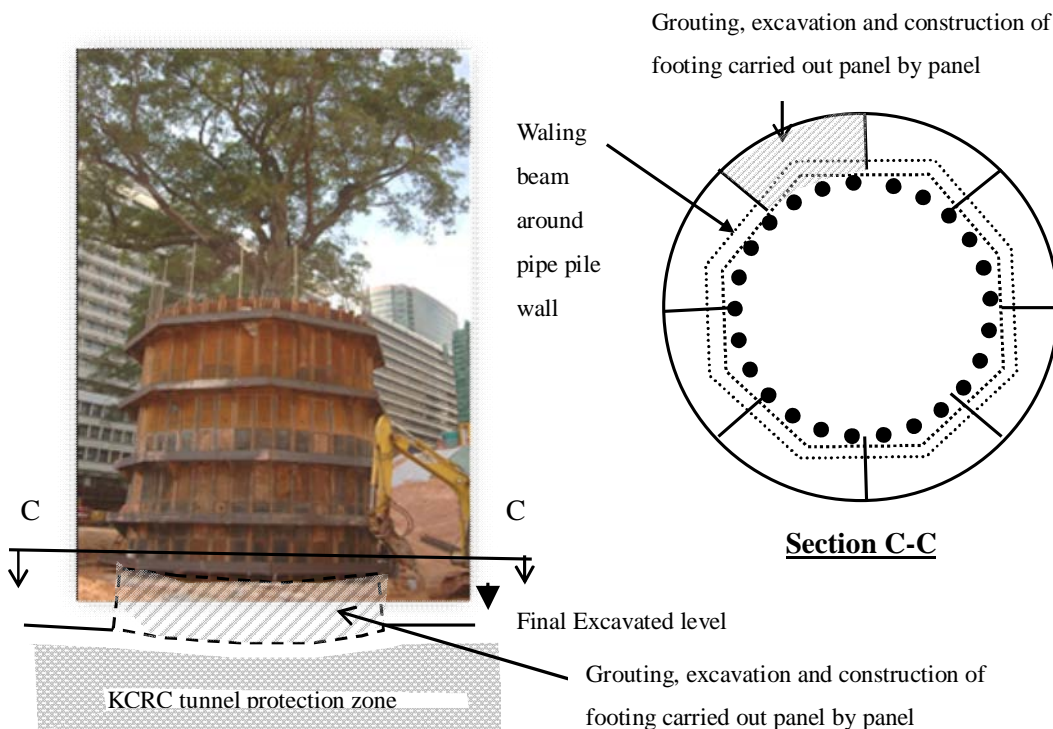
T54 rested on the soil and above the KCRC tunnel protection zone
